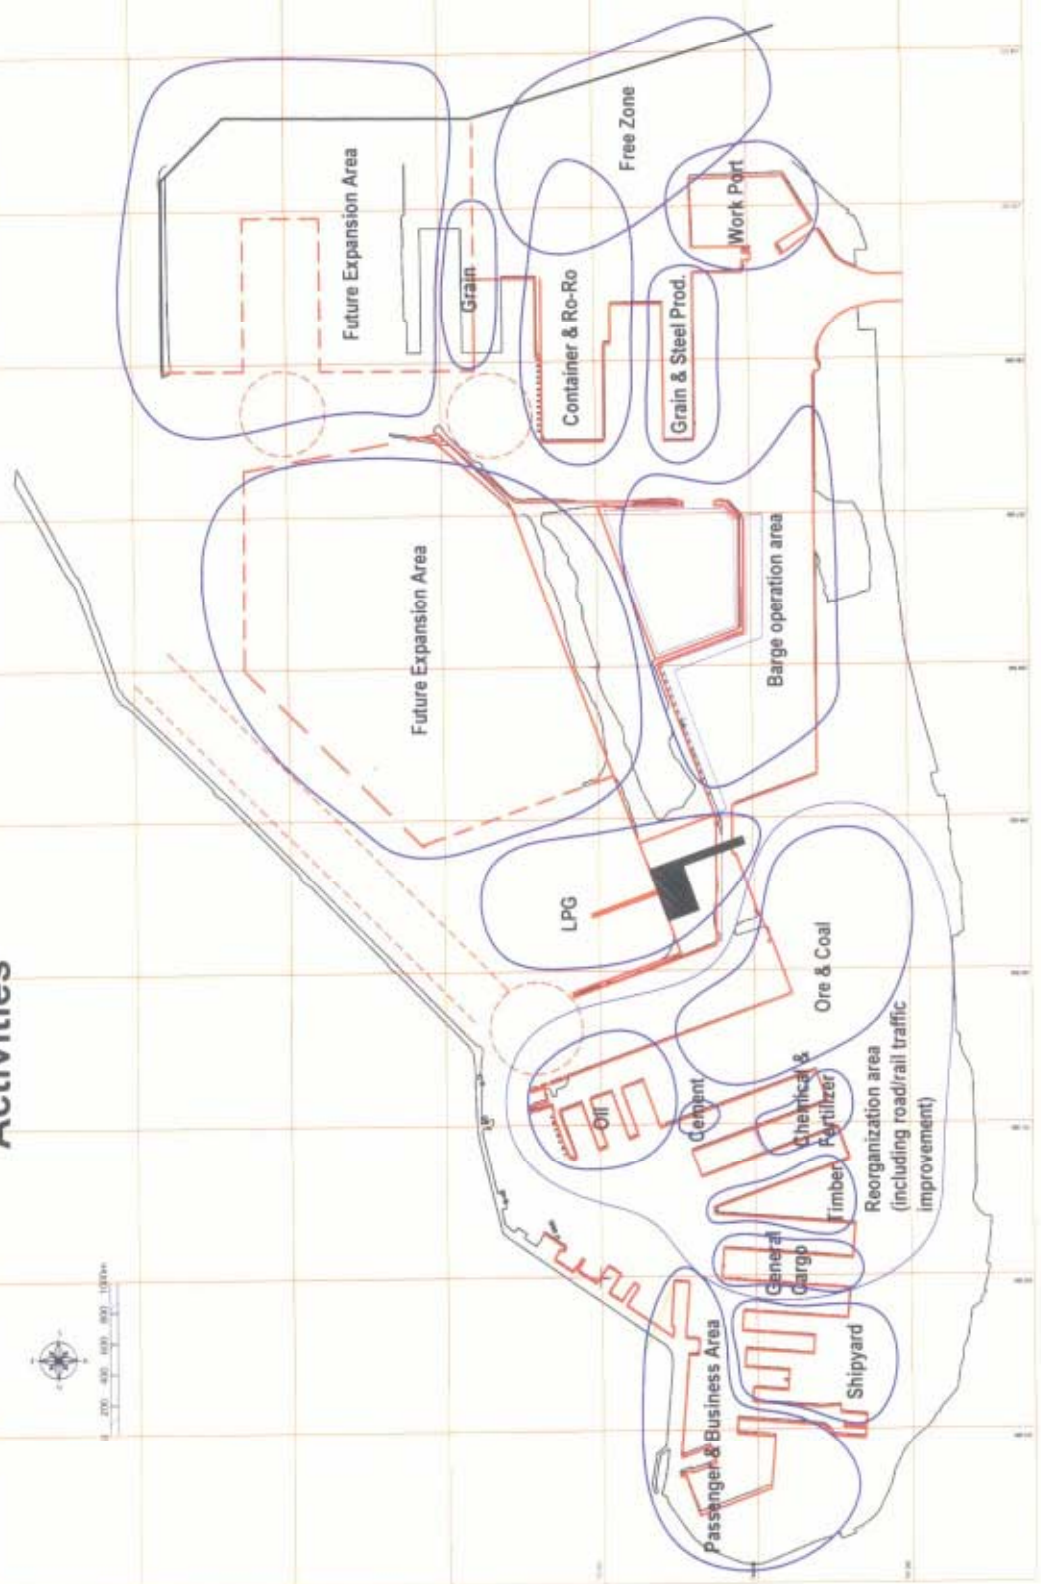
Master Plan Layout (Case-1, 2020, Layout Plan-A)
